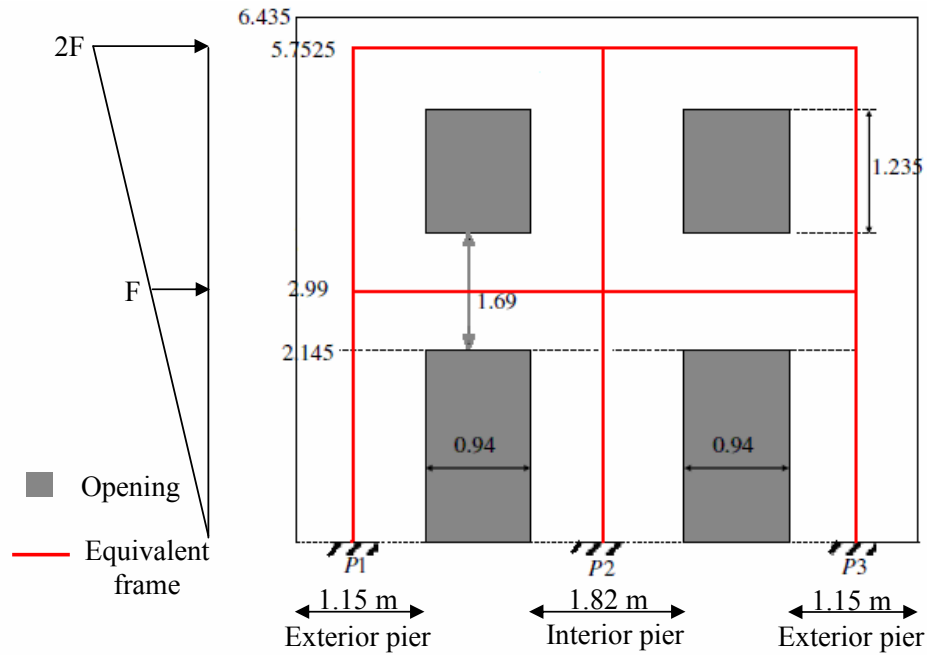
Door wall of the full-scale, two-story unreinforced masonry building tested at Pavia University
